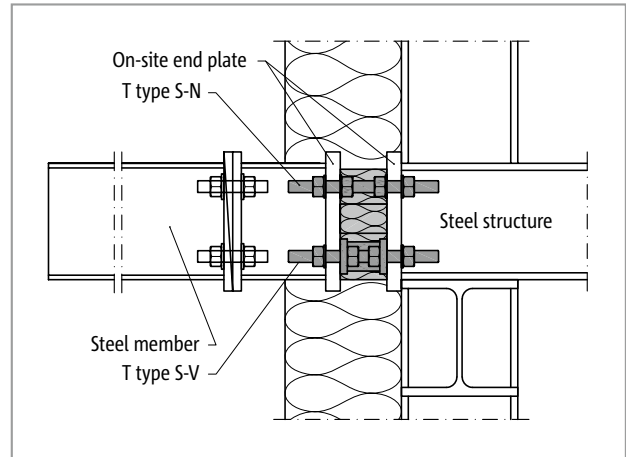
Schöck Isokorb® T type S for cantilevered steel structures ; including first fix bracket
